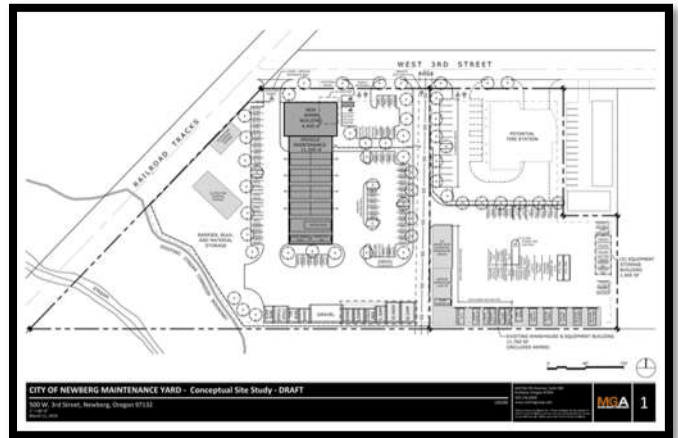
CONCEPTUAL PUBLIC WORKS MAINTENANCE YARD PLAN
